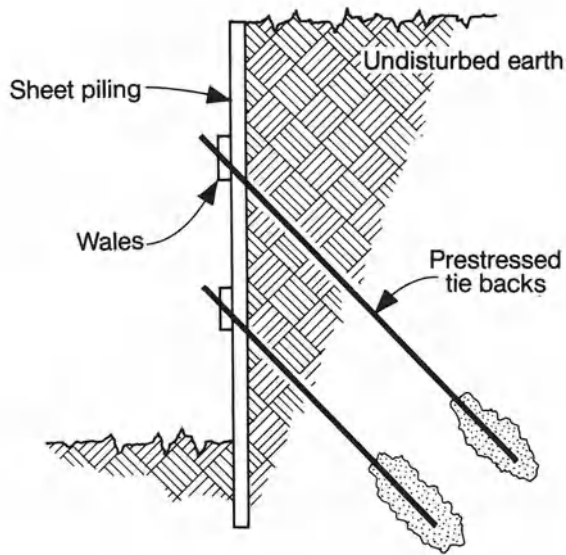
Typical detail of a steel sheet piling retaining wall.
